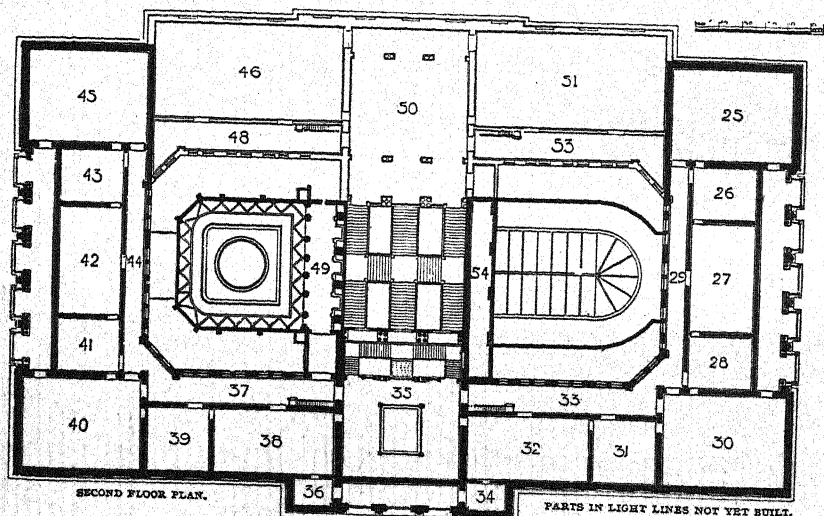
Art Institute of Chicago. Second-floor plan.
